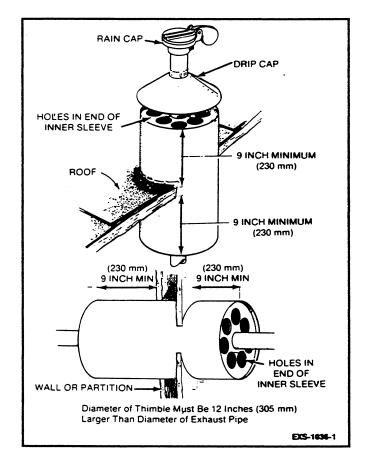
MOUNTING EXHAUST THIMBLE THROUGH ROOF OR WALL
